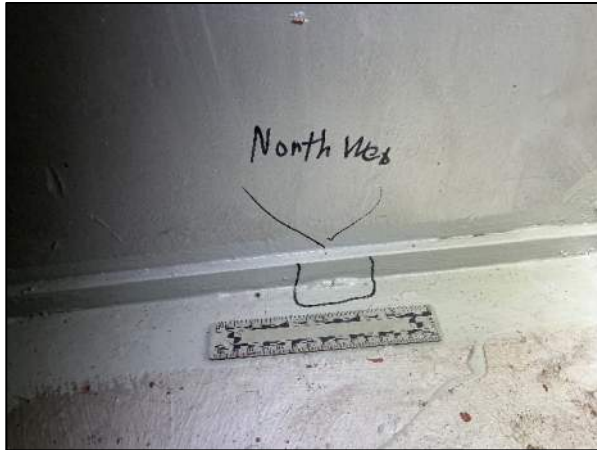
1-1/2" tack weld on bottom flange at the north web of Pier Cap 3 east of Girder 3.
